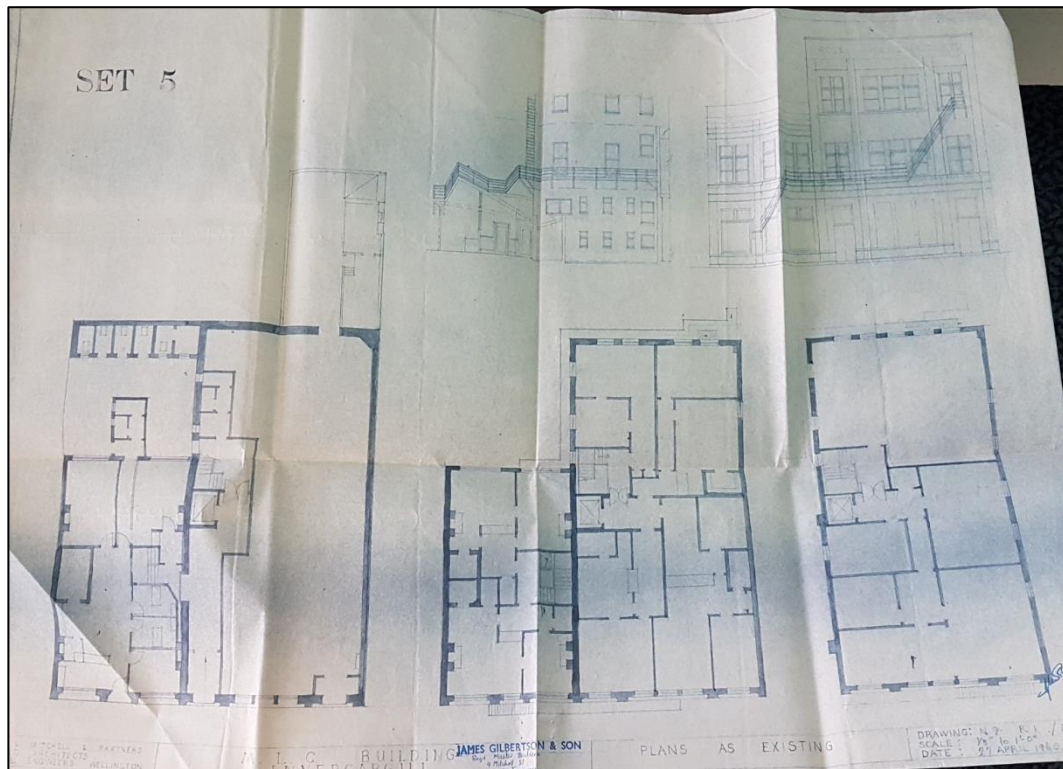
1960 plans and elevations of Ross & Glendining building (James Gilbertson & Son, 1960).
